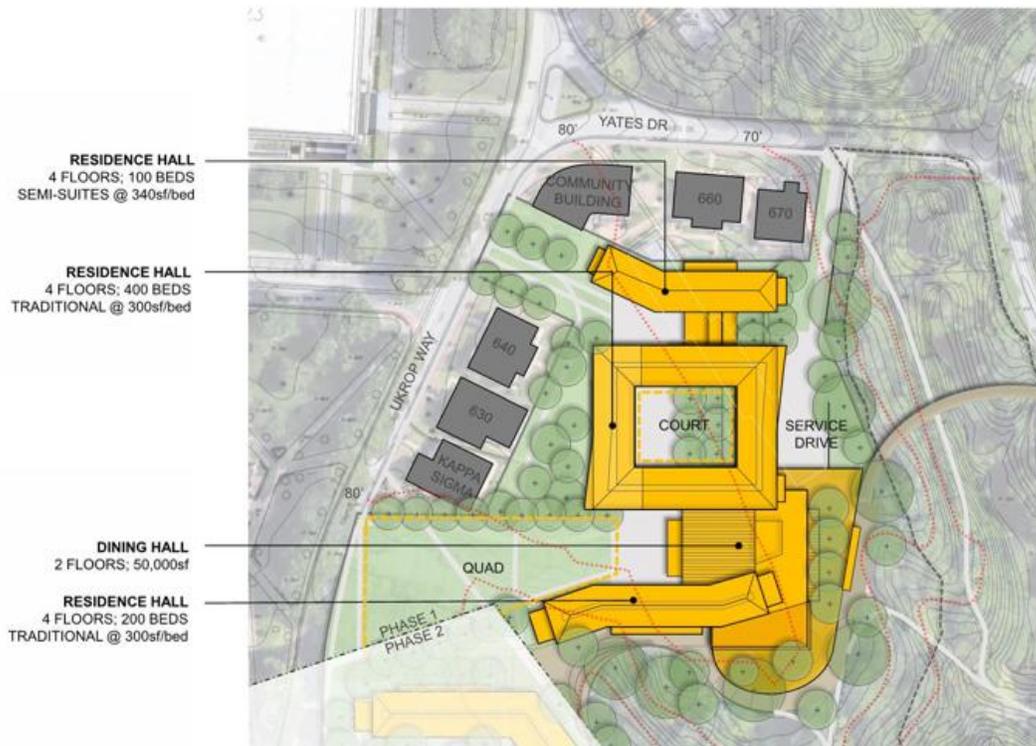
Conceptual Site Plan for New West 1 Housing and Dining (VMDO)
